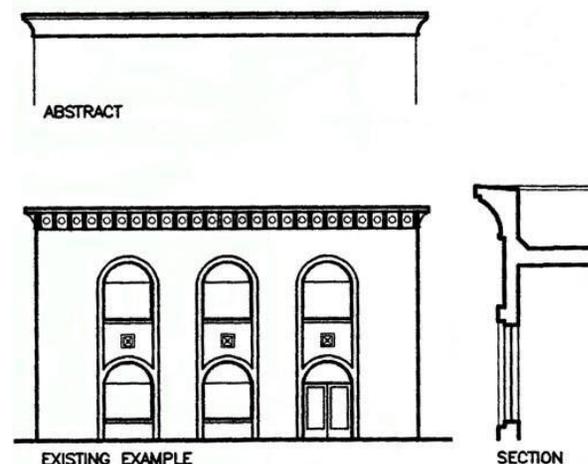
A contemporary interpretation of a classical parapet forms a single, strong, building cap.
